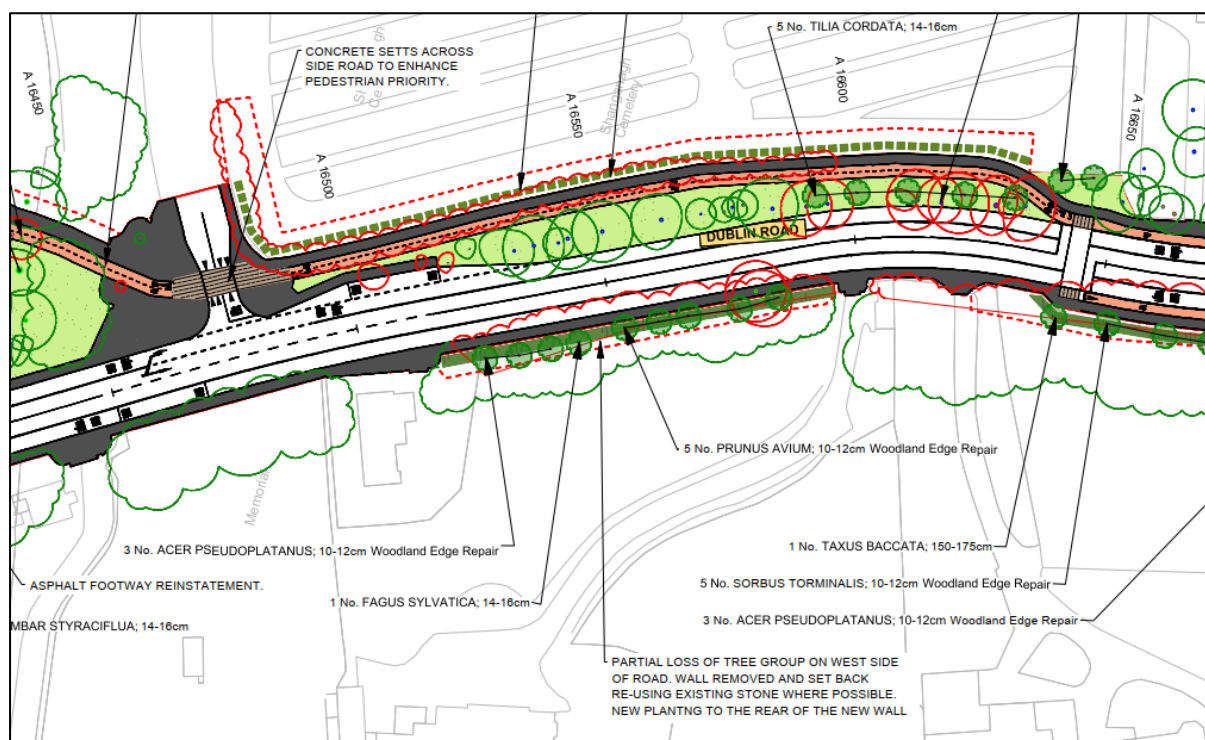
Extract from Landscape Drawings at Askefield House on Dublin Road (Sheet 47)
